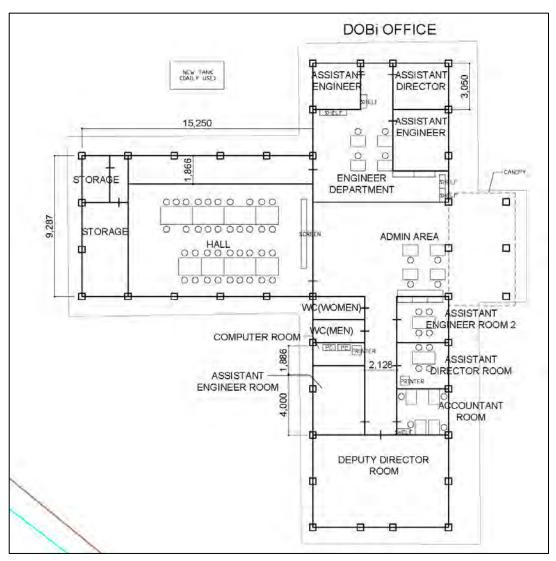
Survey Drawing of Existing Building of BiRL Research and Testing Facilities (Administration Office)
